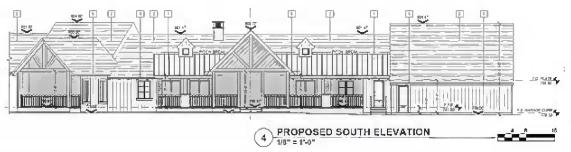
Proposed Elevation (Secondary Residence - ADU)
